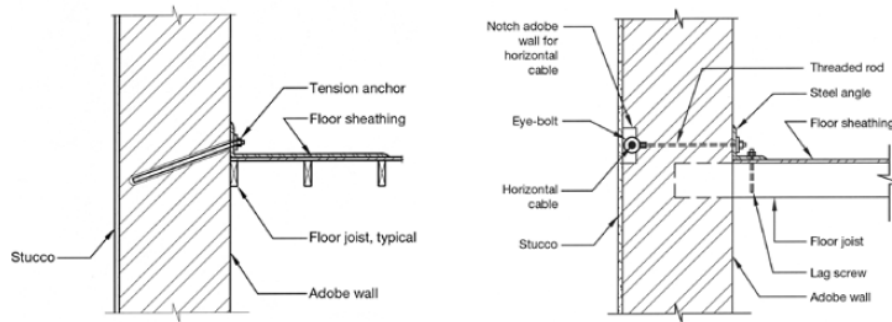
Wall-floor connection for earthen walls. To the left, technique discouraged by Tolles (2006). To the right, wall-floor connection proposal by Tolles (2006) to avoid localized stress damage to earthen walls.
